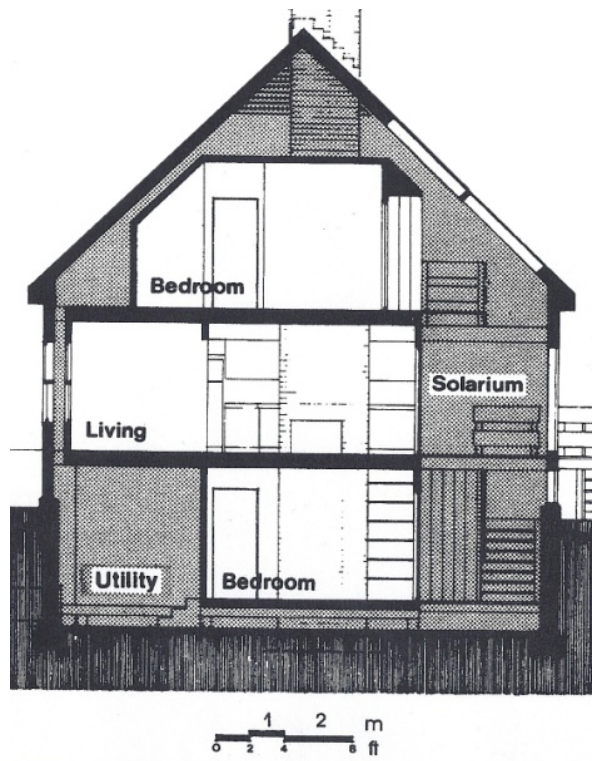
Section of the Mastin double-envelope house (Jones et al., 1982)
